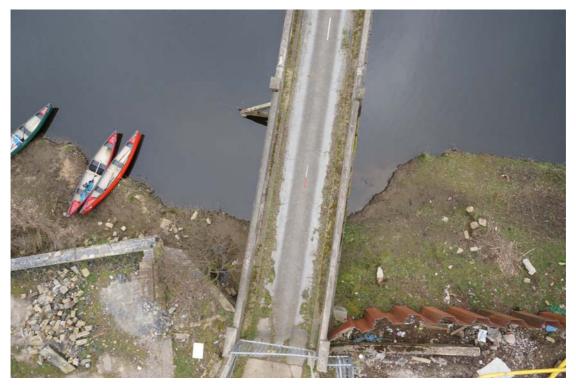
Aerial view showing bridge deck (14) flanked by parapet walls (10) (DSC00475)
